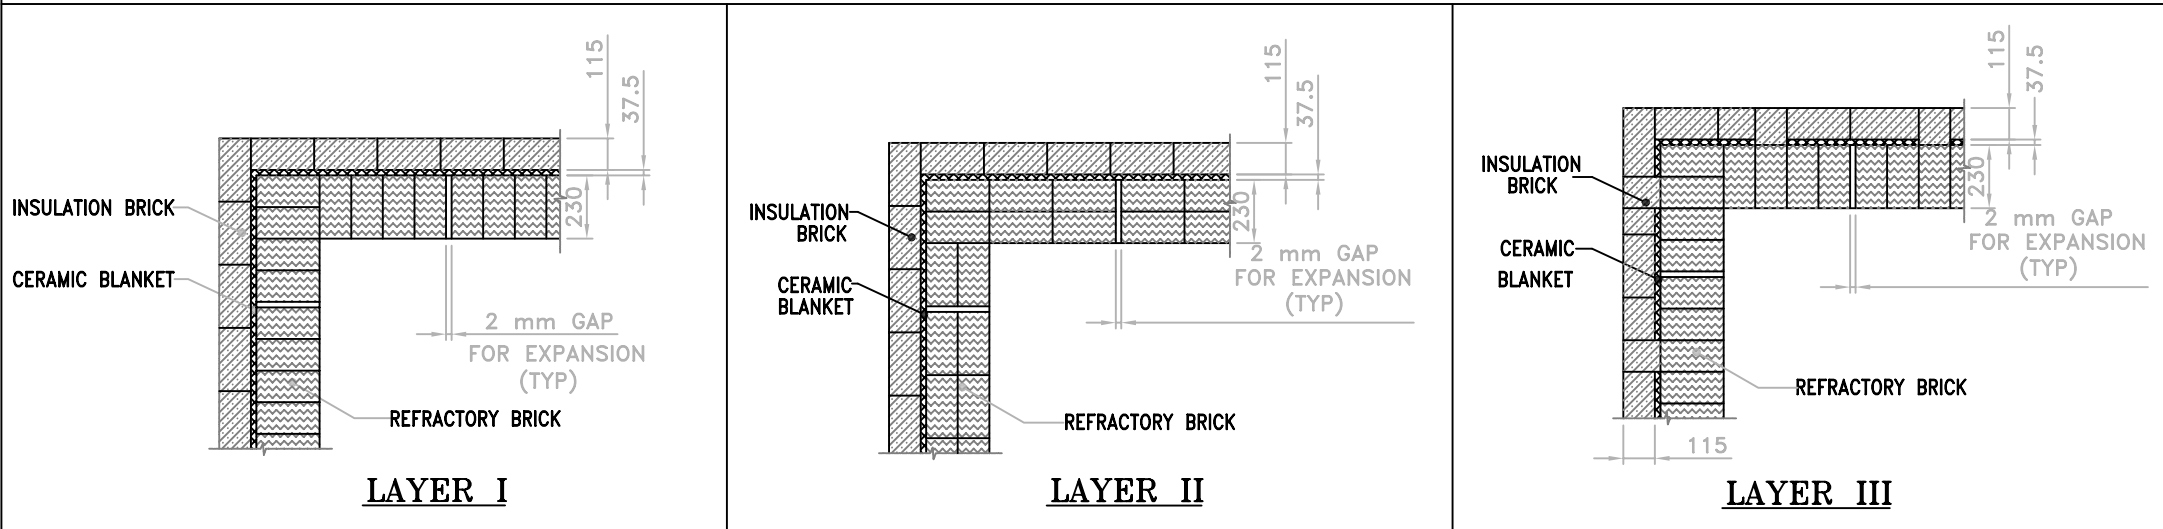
TYPICAL FURNACE REFRACTORY ARRANGEMENT
